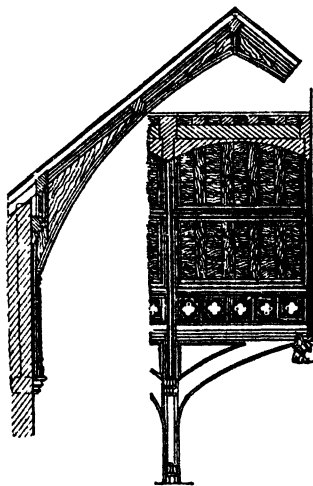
Arch-braced roof over nave of Briton Church, Norfolk, Eng.
